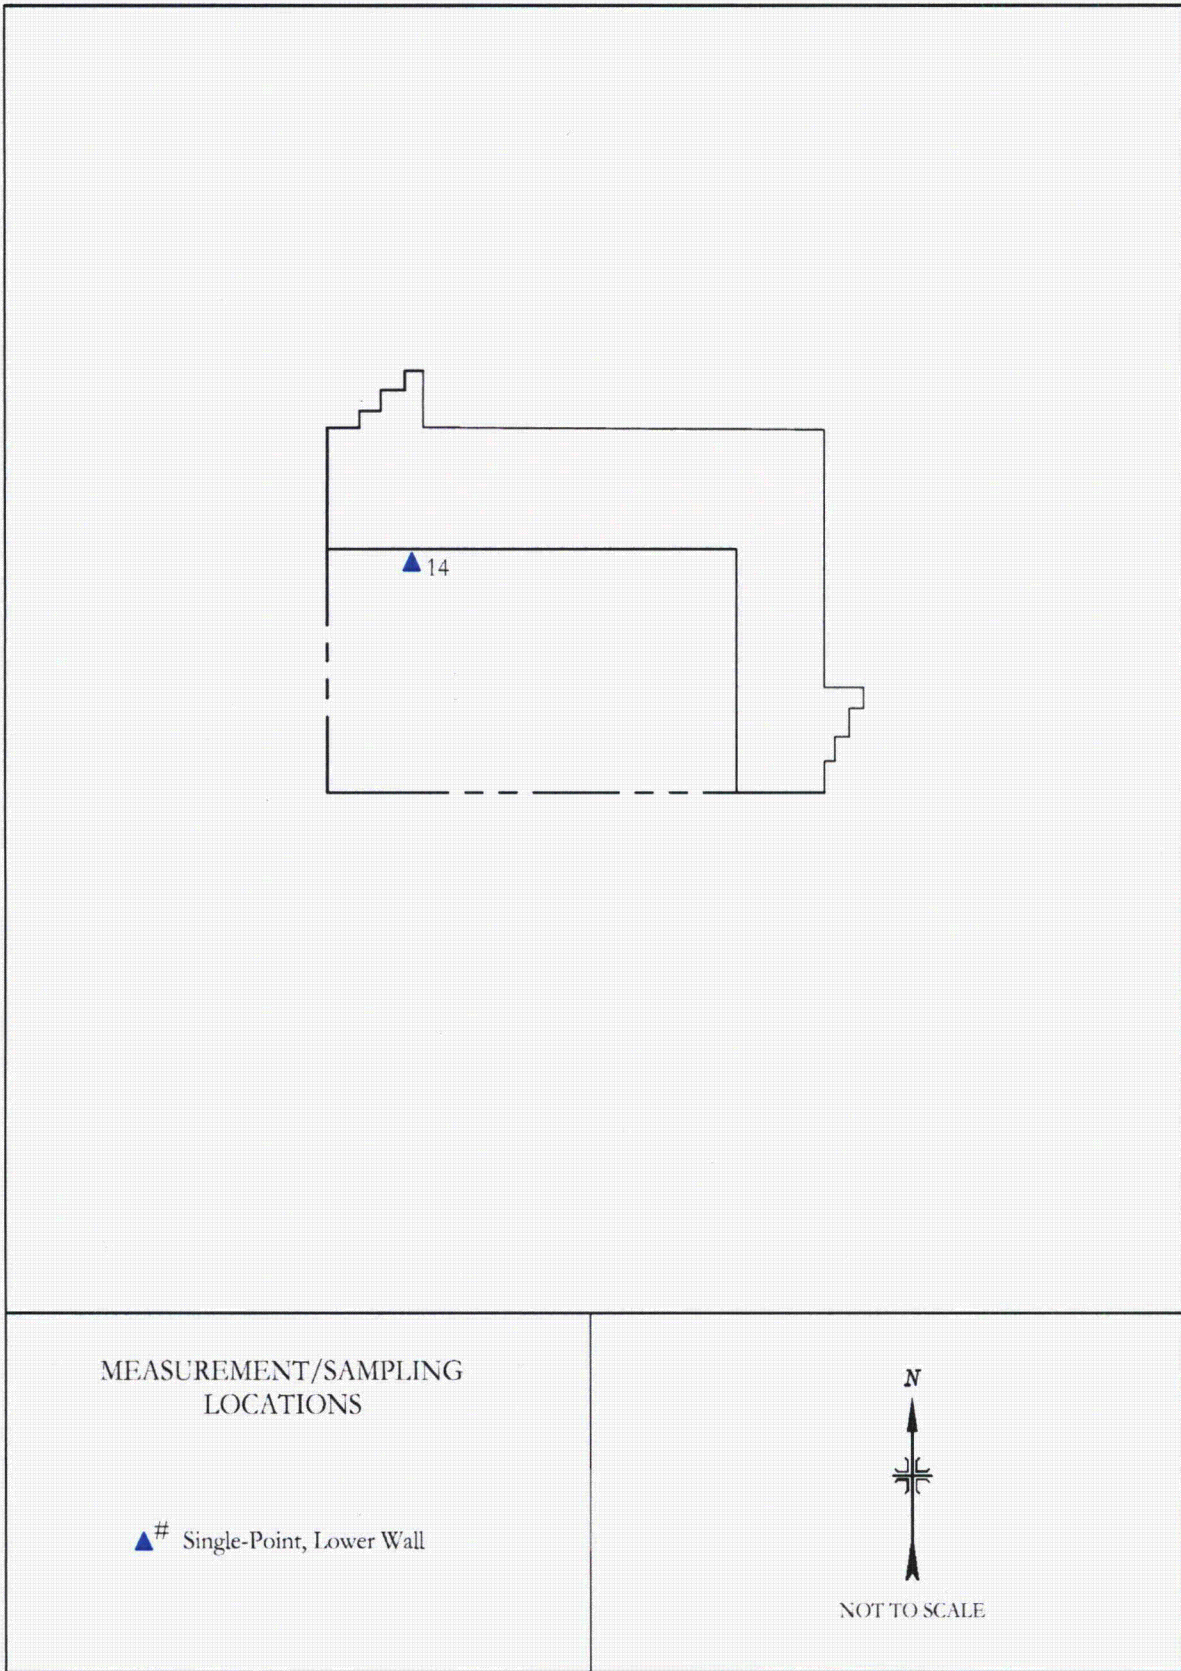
Auxiliary Building, Room 49 - Direct Measurement Locations
